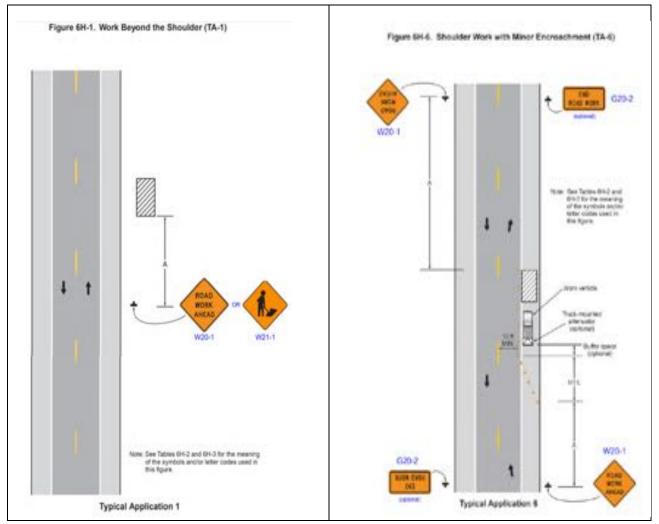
A AND 3B. TRAFFIC CONTROL CONFIGURATIONS – CONSTRUCTION OUTSIDE OF ROADWAY
